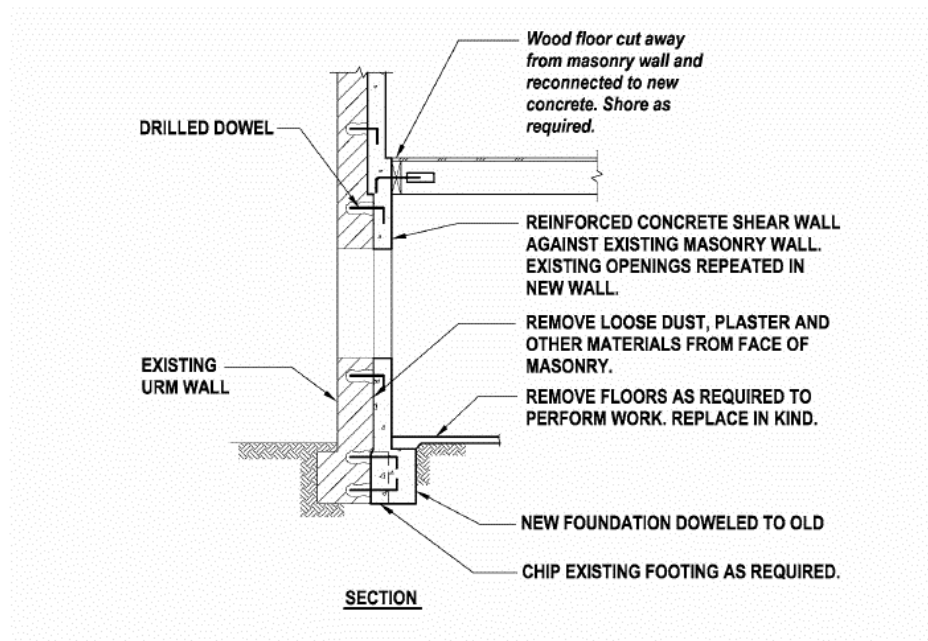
Shotcrete of existing URM walls (FEMA 2007)
